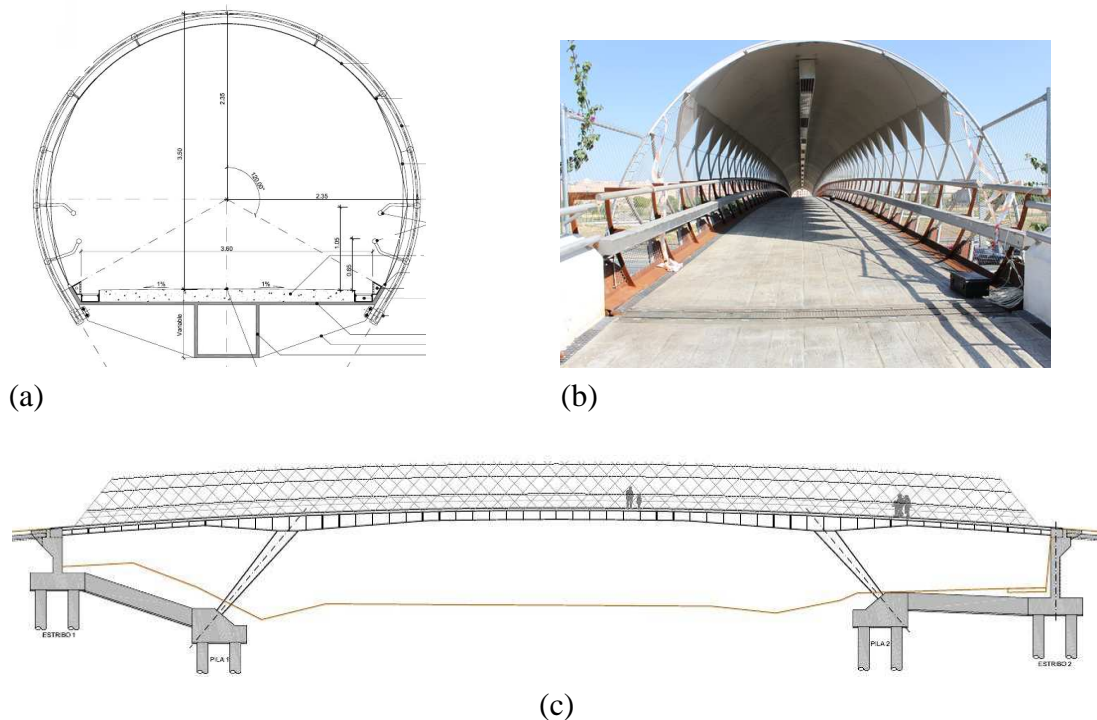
(a) Standard section of the bridge (b) Front view of one end of the bridge (c) Lateral drawing of the bridge including foundation
